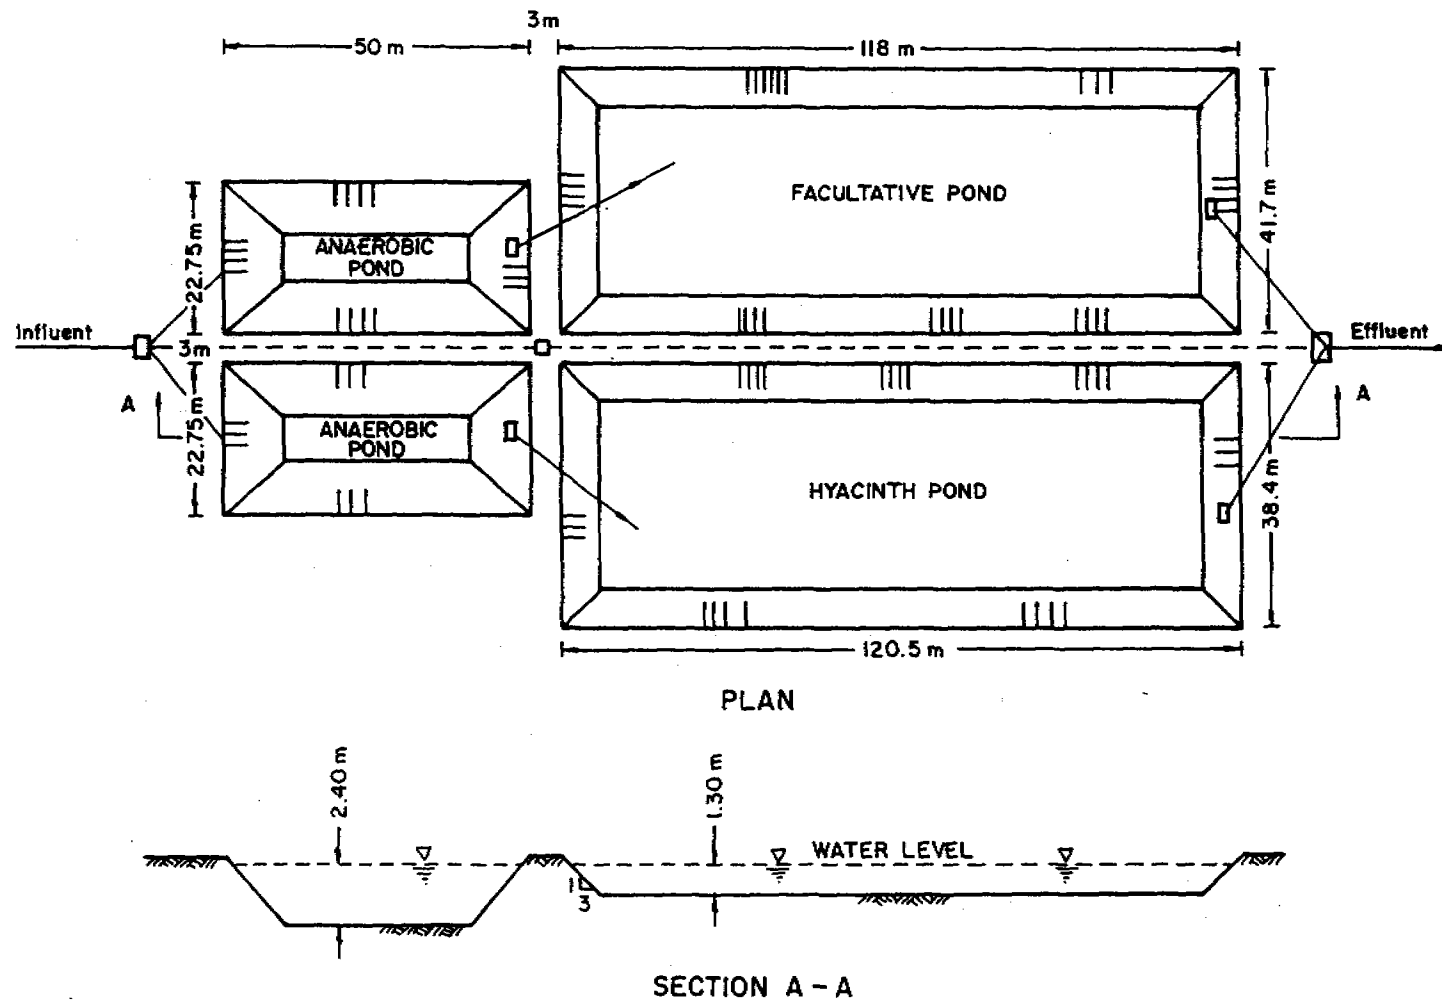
Layout of AIT Waste Stabilization Pond
